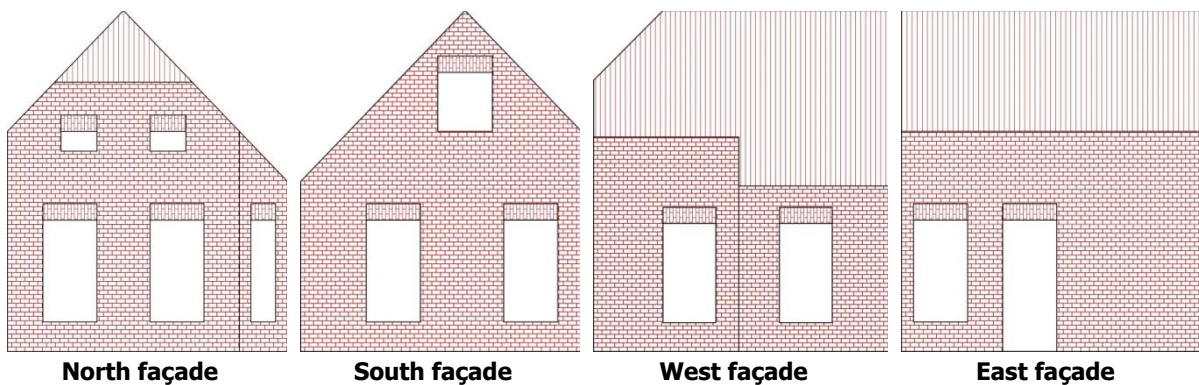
Layout of the façades of reference building EUC-BUILD-2, as studied in the current work.
